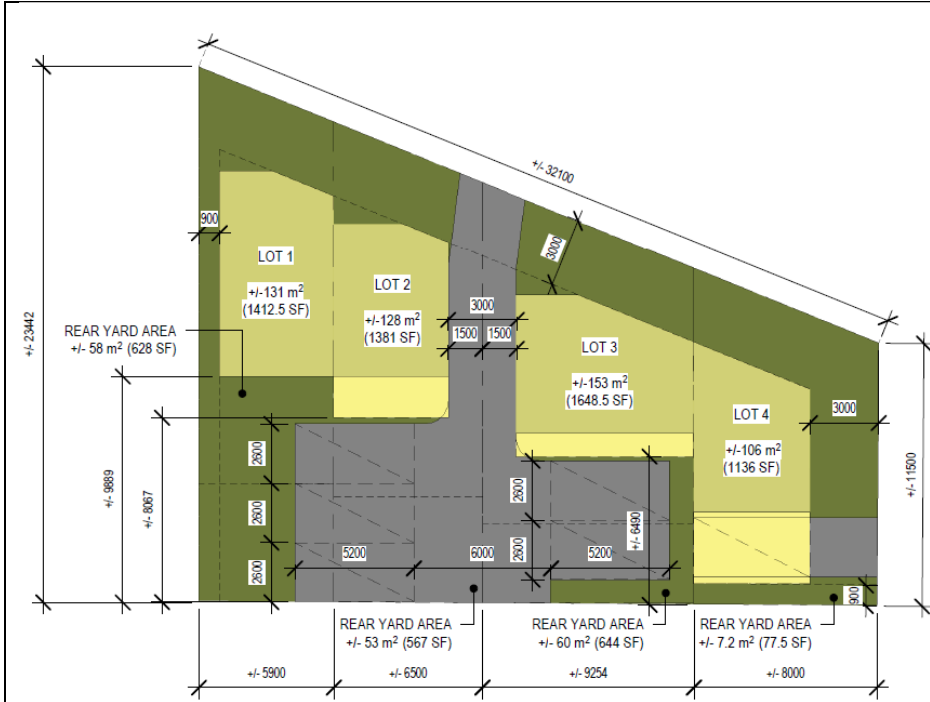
Preliminary Site Plan by Lara McKendrick Architecture Inc, previously reviewed by City of Ottawa
